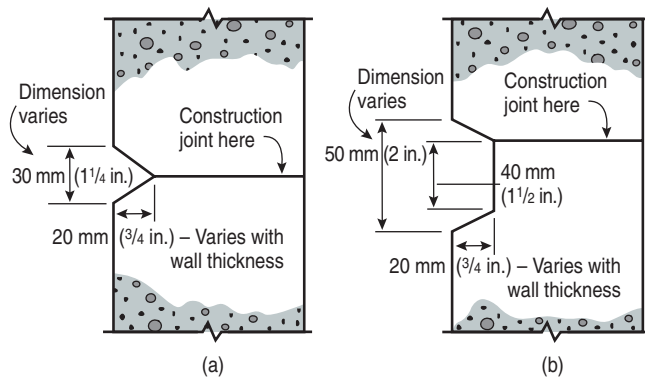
Horizontal construction joints in walls with V-shaped (a) and beveled (b) rustication strips.
